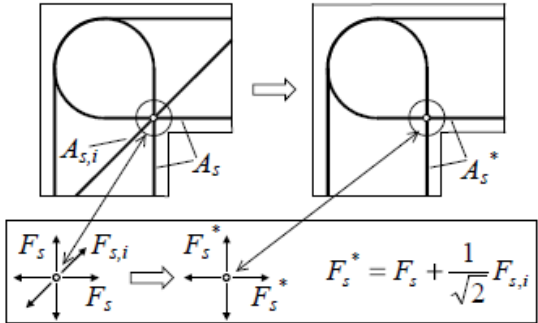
Replacement inclined bar with enough longitudinal reinforcement to resist an opening moment (Johansson, 2000).
